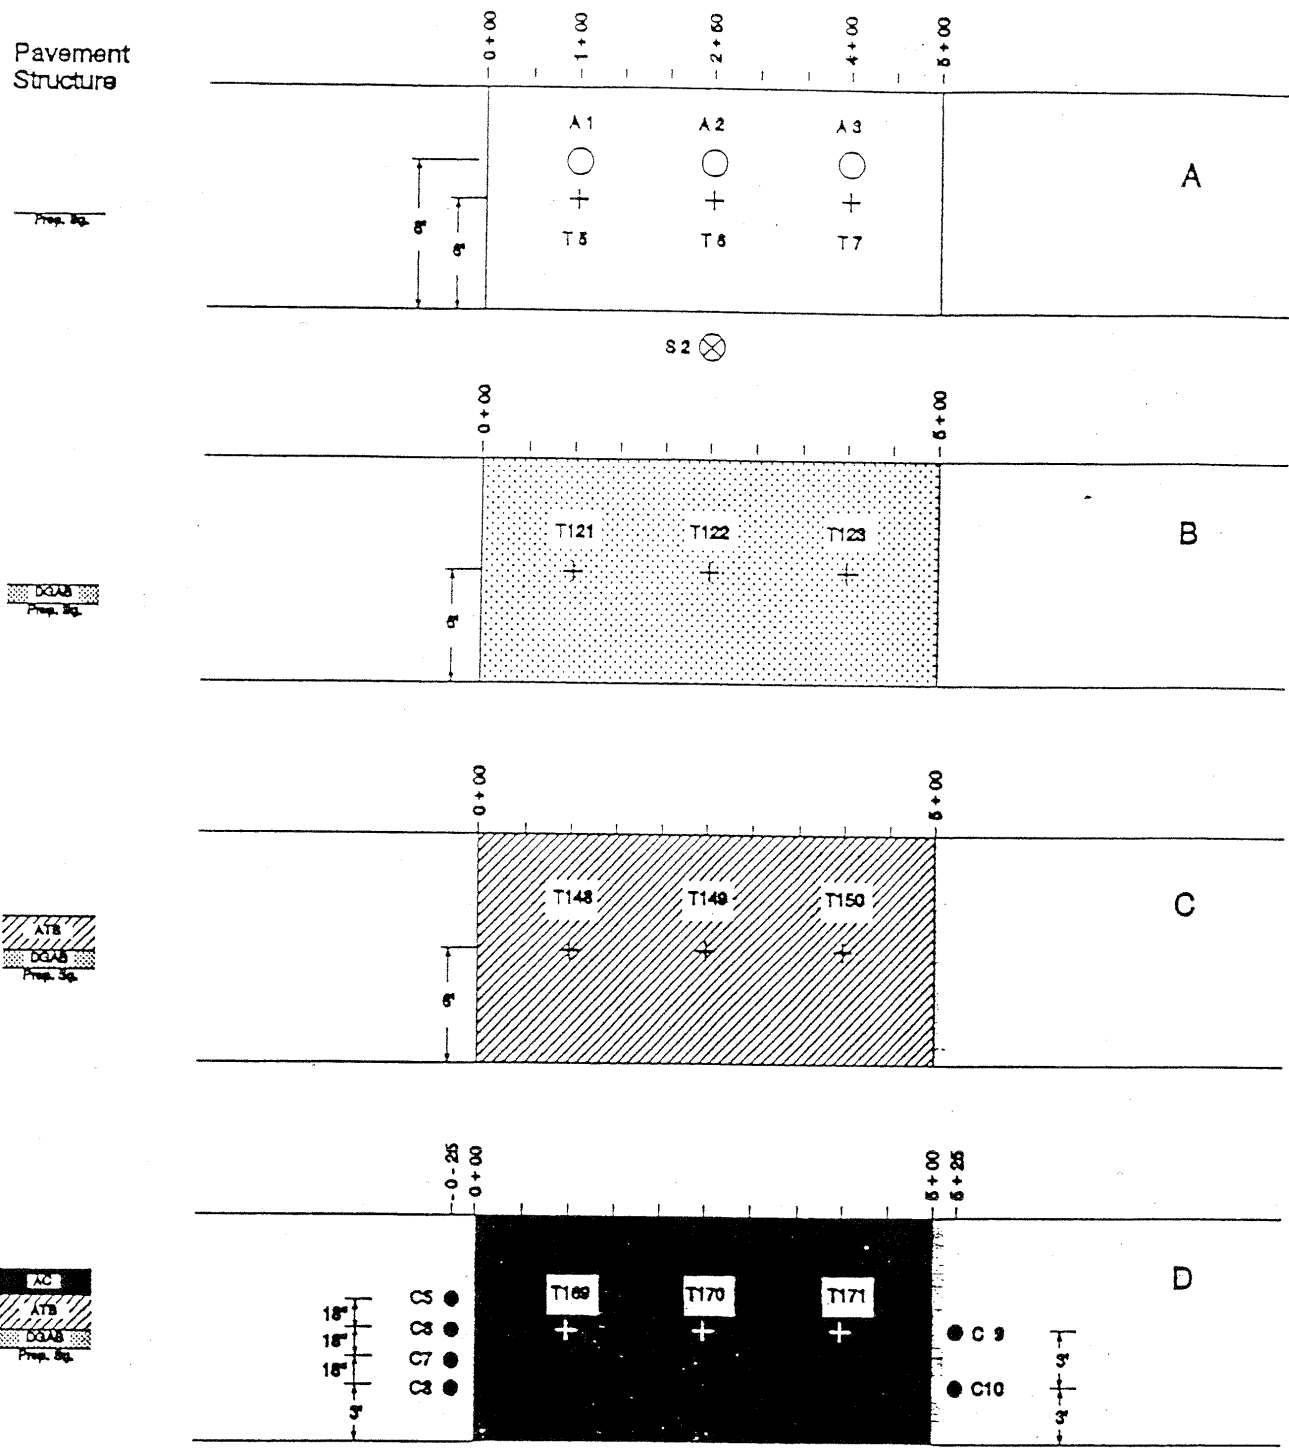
Sampling and Testing Locations for Subgrade (and Embankment Layers ≥ 1.2 m [4 ft])
